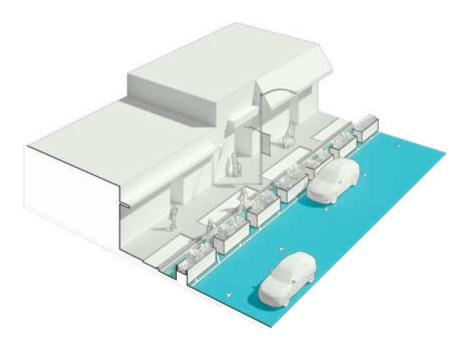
One-Way, In-Street Class IV Bikeway, Adjacent to On-Street Parking, Protected by Planter Boxes and On-Street Parking.
